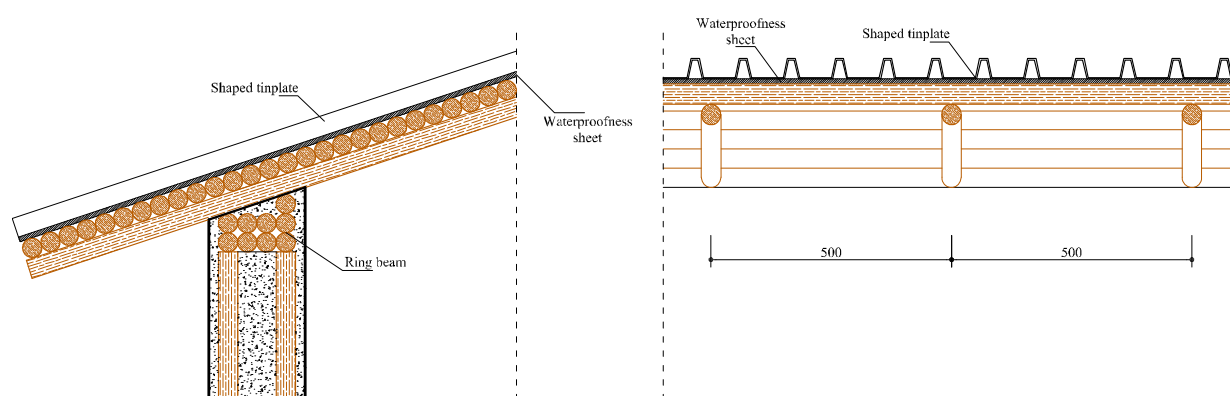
(left) Ring beam cross-section; (right) embedding detail for the primary roof beams within the ring beam
